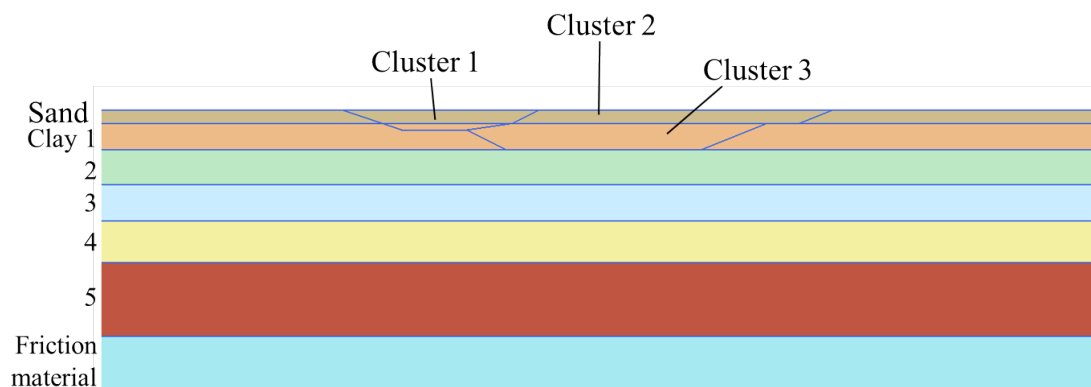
Excavation 1 – section A, with the three soil clusters pointed out.
